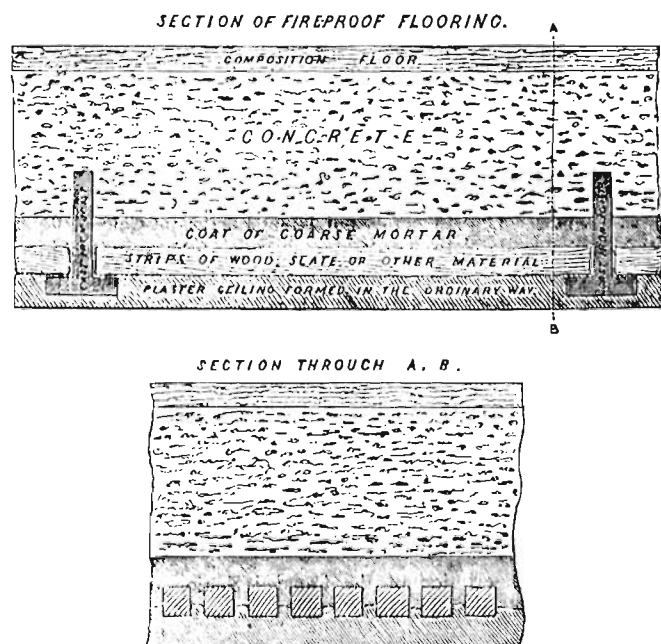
Early Fox & Barrett flooring with cast-iron joists
